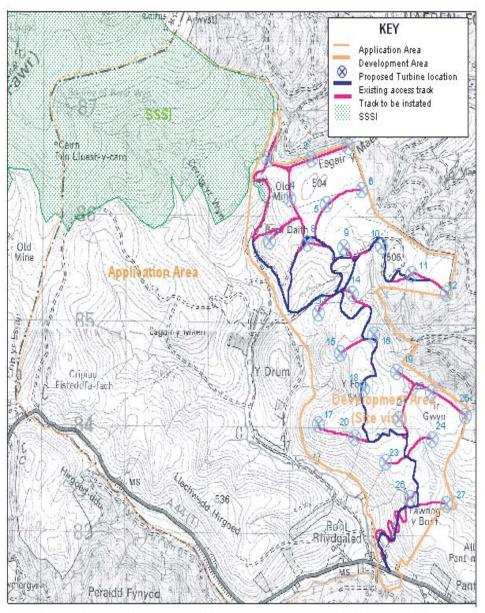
Site plan showing Application & Development Area with proposed position of Turbines and access tracks.
